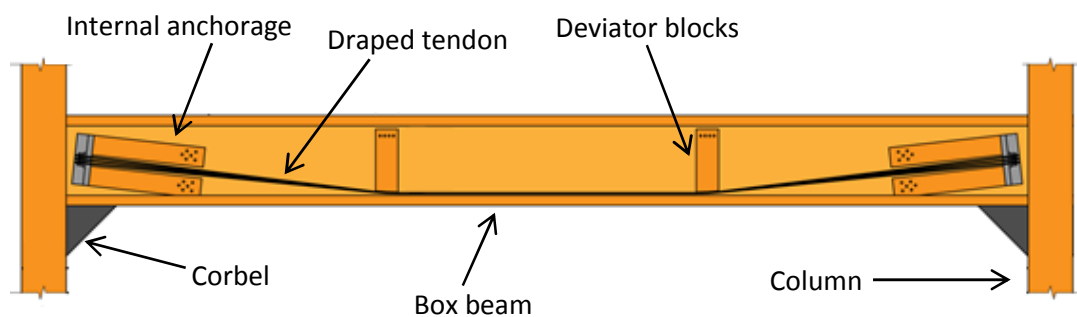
Post-tensioned box beam with a draped tendon (STIC, 2013)
